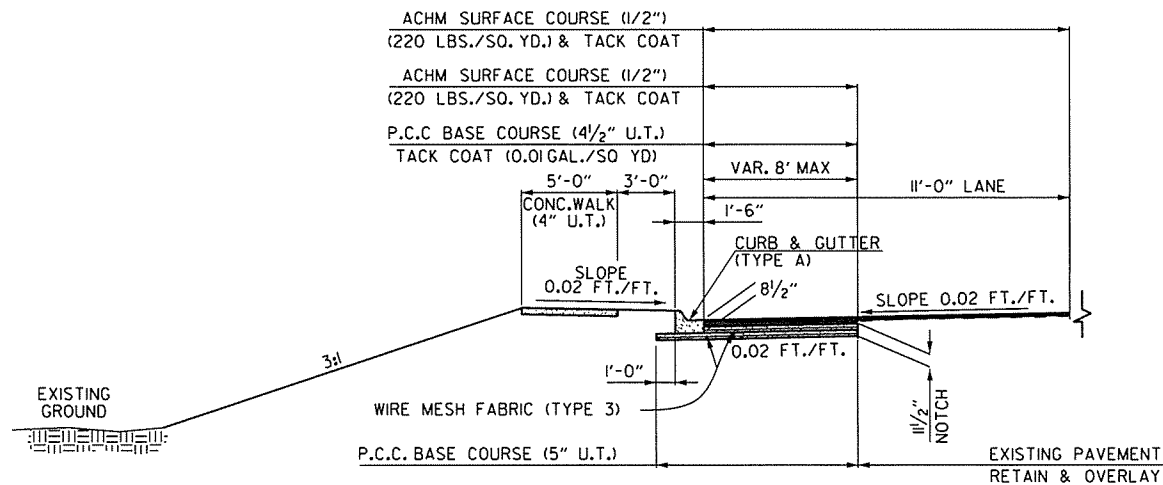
DETAIL FOR COUNTY ROAD TURNOUTS WITH CURB & GUTTER
